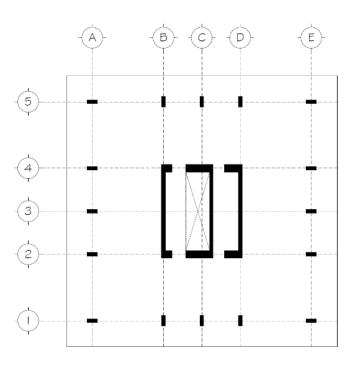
Plan view of 30-storey case study building showing outline of floor plate, central core and arrangement of gravityload columns; Note there five different GLRF in each direction.
